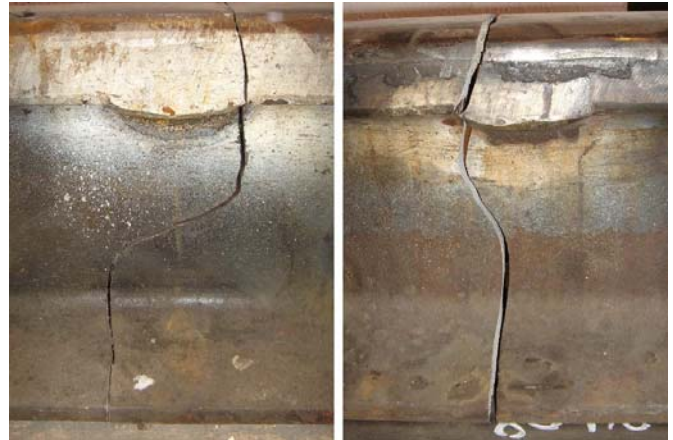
Photos Showing Typical Railhead Repair Weld Fractures
